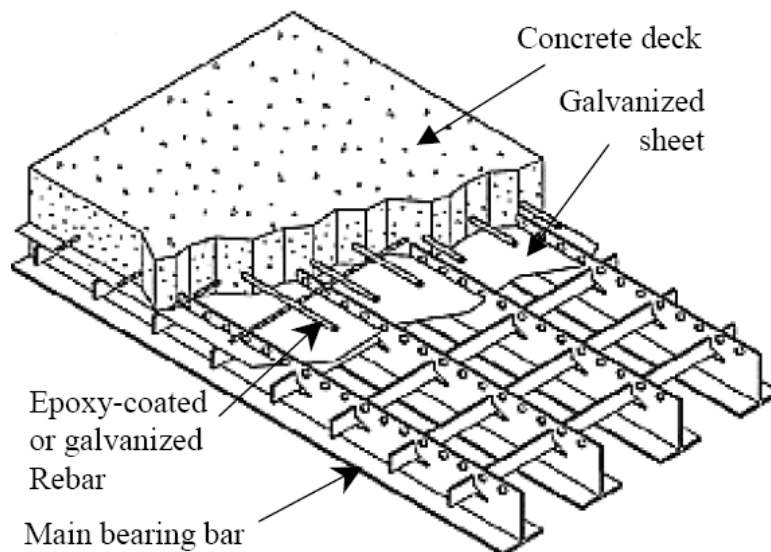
Revised Exodermic Bridge Deck System (EBDI 2011)
